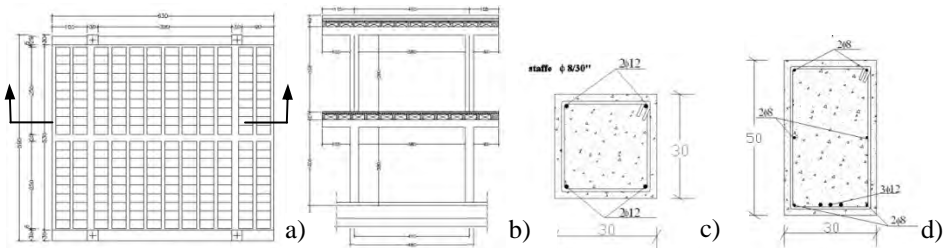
First floor carpentry (a), longitudinal section (b), column (c) and first floor beam (d) of the structural module n. 5.
